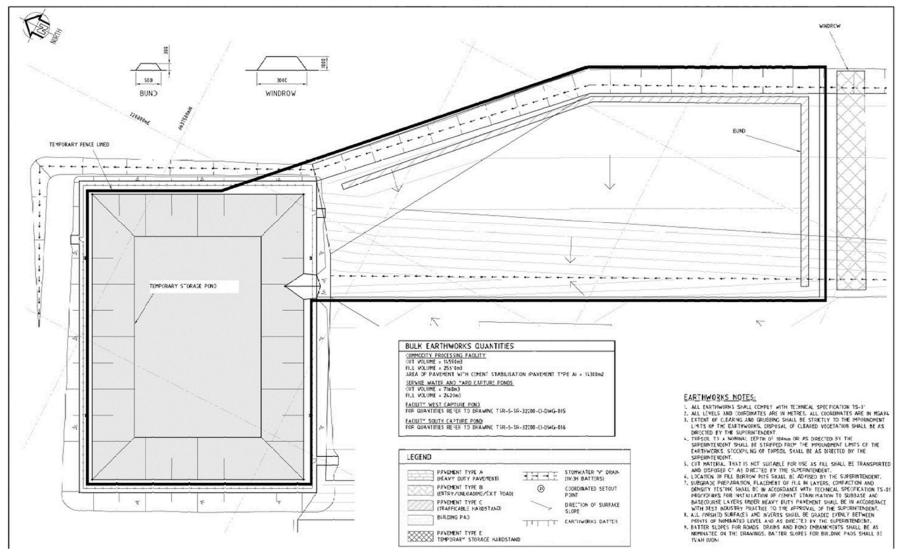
East Yard (solids) Storage Area – drainage, bunding and pond detail Figure provided by the Applicant
